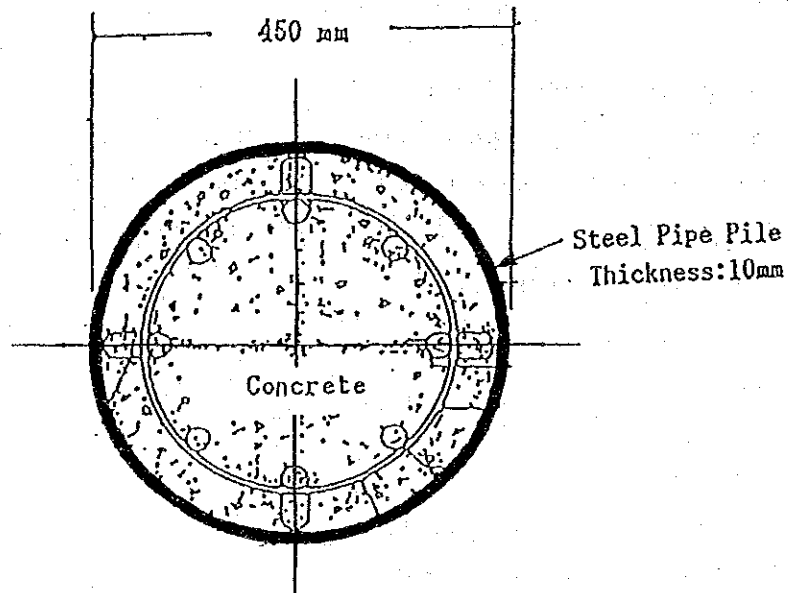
Typical Cross-Section of Pile in Sg. Merah Oil Jetty
